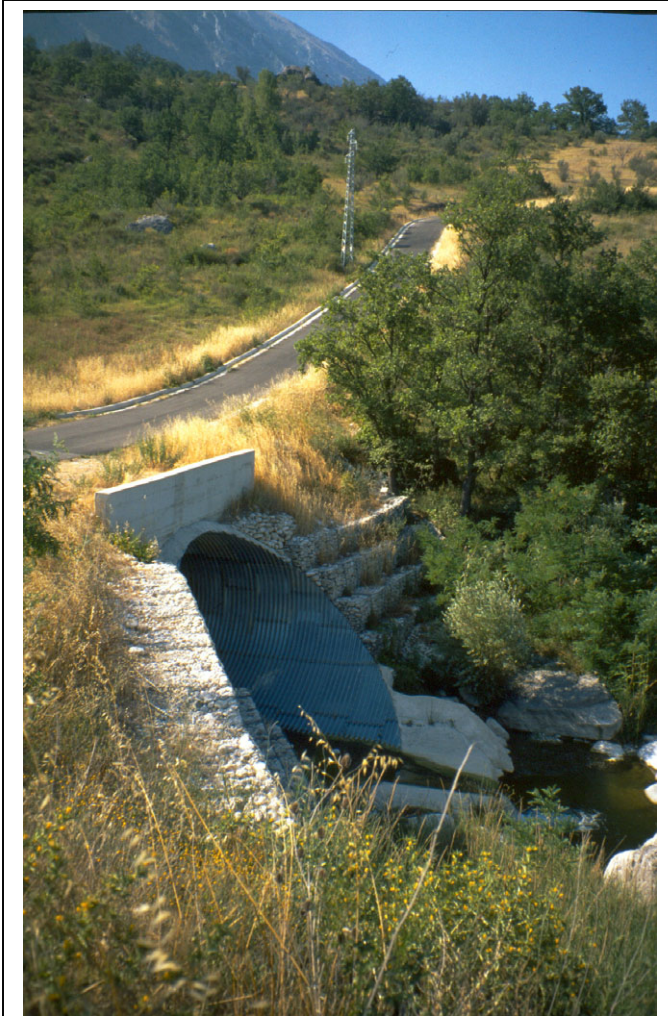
New section of road and earthen/culvert bridge over the Aventino River, which together complete the more direct connection between Lama and Colle. Photo is taken on the Colle side looking north towards the Majella.
